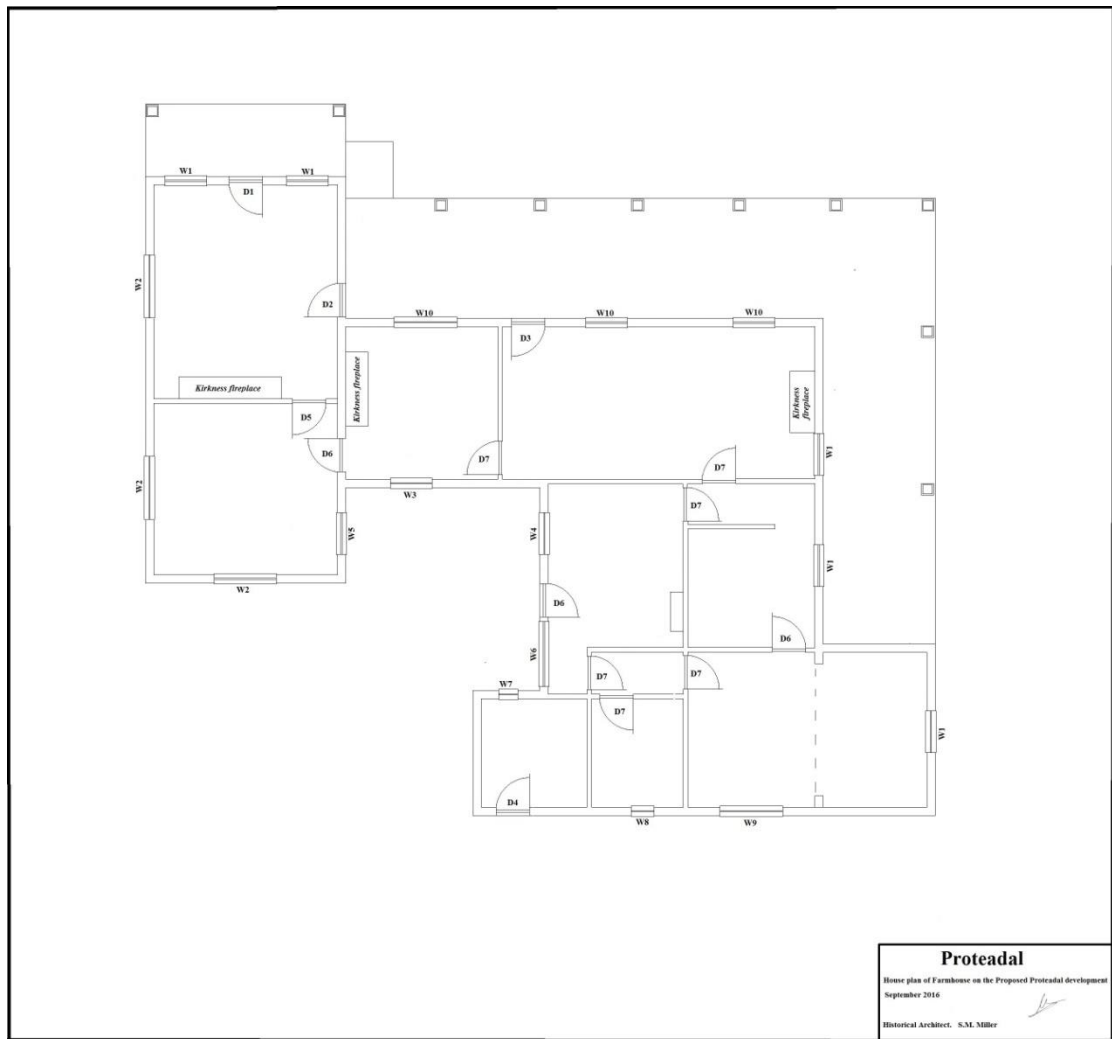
Above is the site layout of the structure under investigation. of the site with places where photos were taken from are marked. Also see figures 02 and 04 for the areas surrounding the building under investigation. (Drawing S.M. Miller 2016.)
